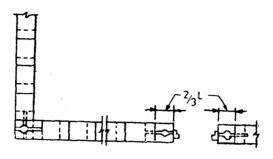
BONDING AT CORNER AND DOOR OPENING FOR VERTICAL REINFORCEMENT
